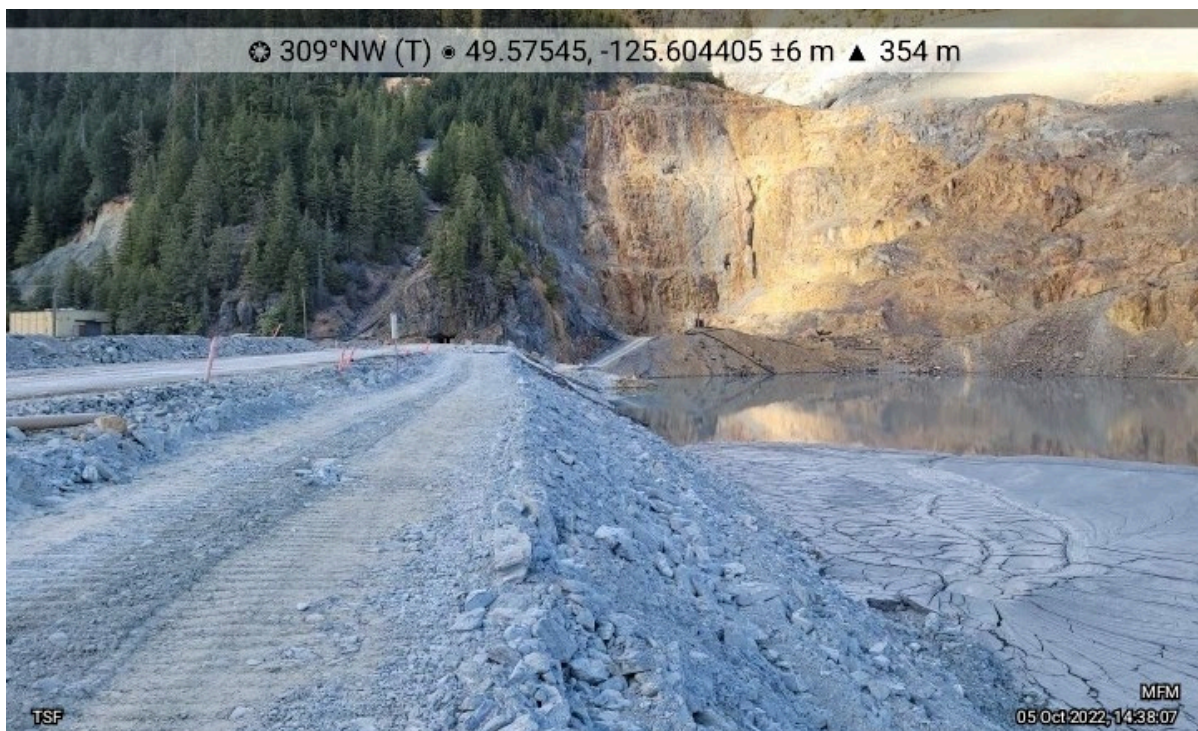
Lynx TDF looking northwest. Crest elevation is at 373.5 m.
